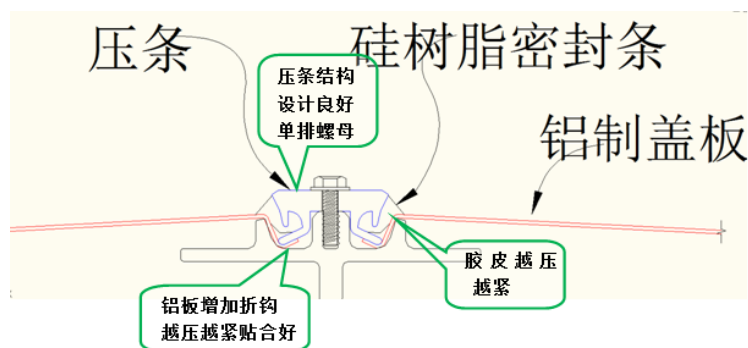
Typical joint design for aluminum dome sealing and connections of B Supplier
